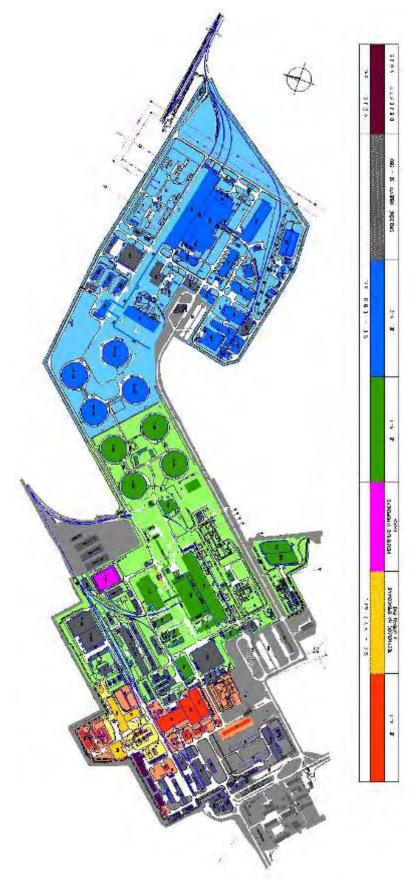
Layout of buildings at GovCo (JAVYS) and SE EBO site.
